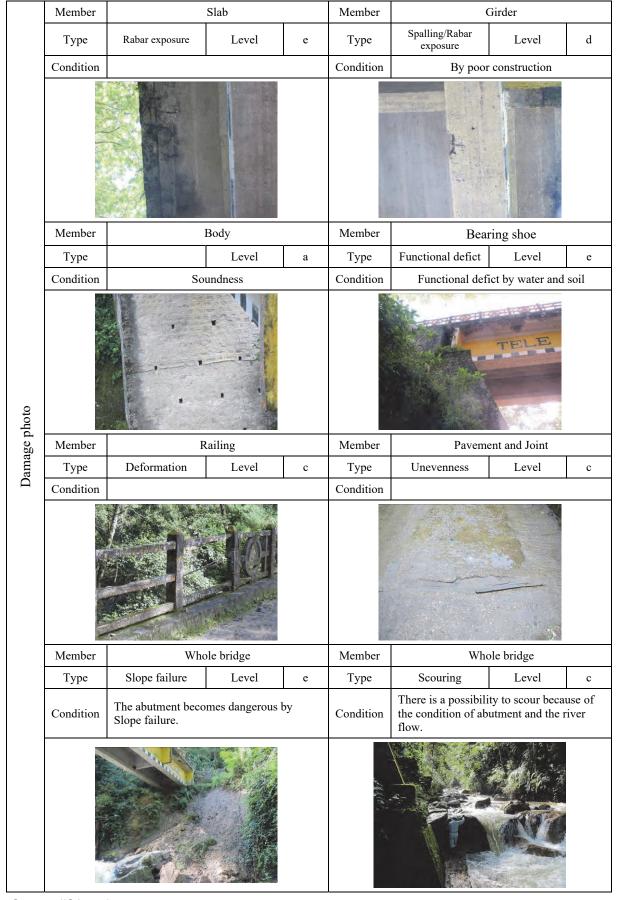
The bridge ledger of Telegangchu bridge (2/2)
